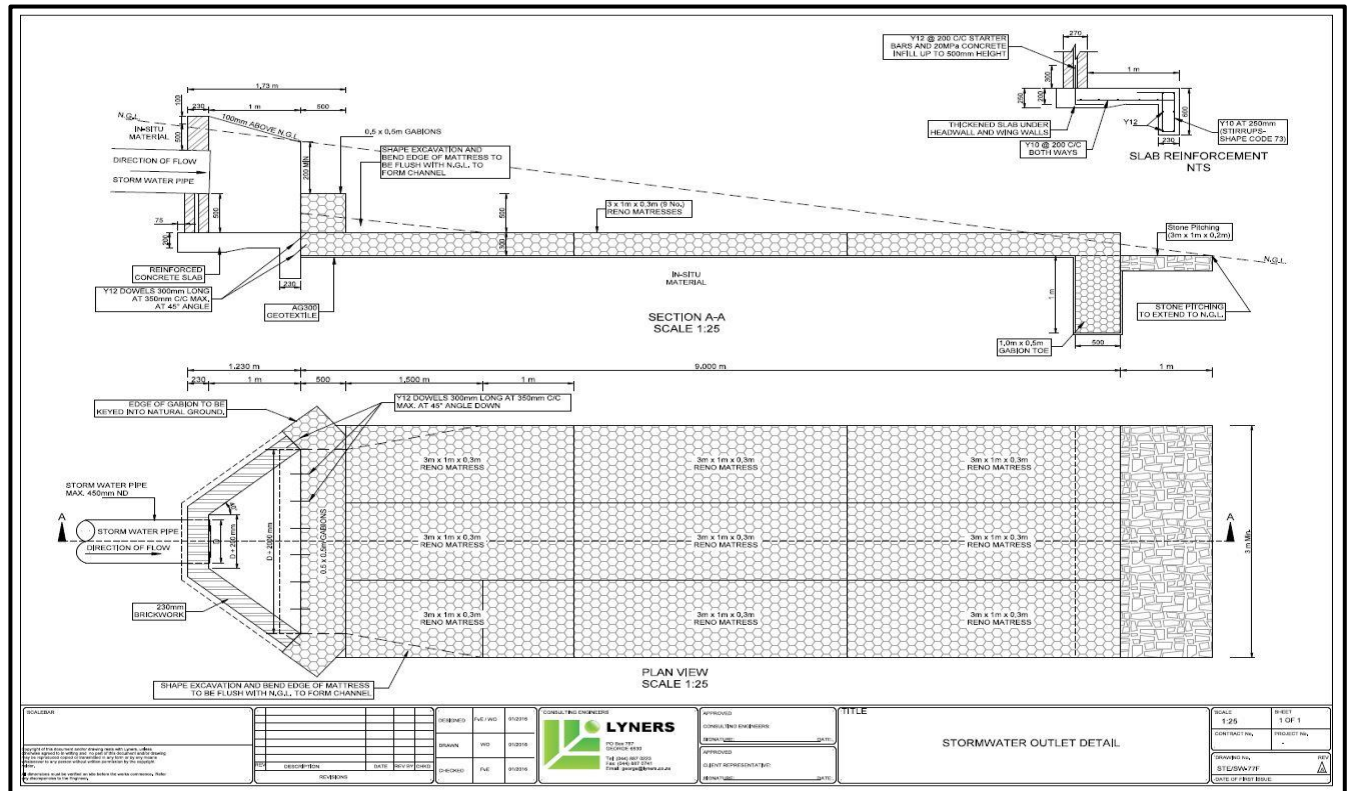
Stormwater Outlet Structure Design Drawing 2.
